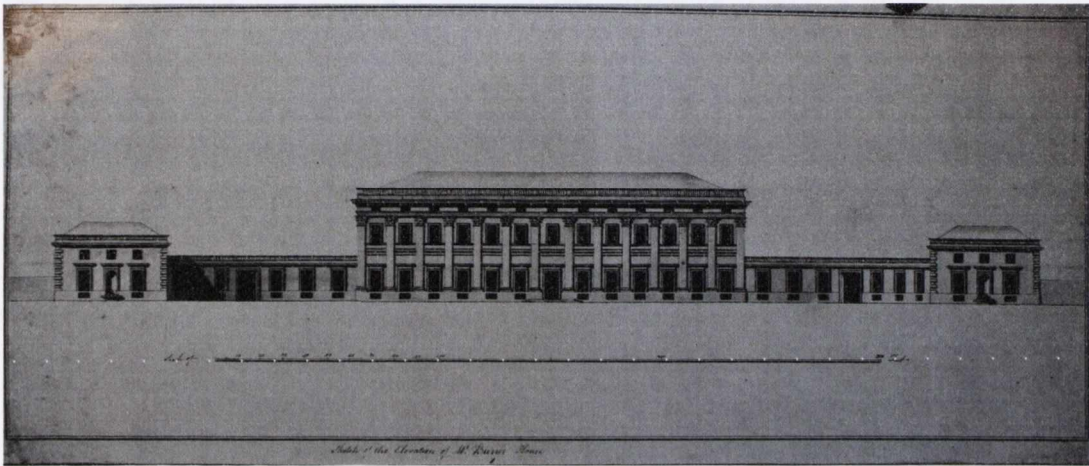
Proposed scheme for Charleville, photograph of elevation, attrib. to James Byres, [1789], IAA, A/4/1, courtesy of the Irish Architectural Archive.
